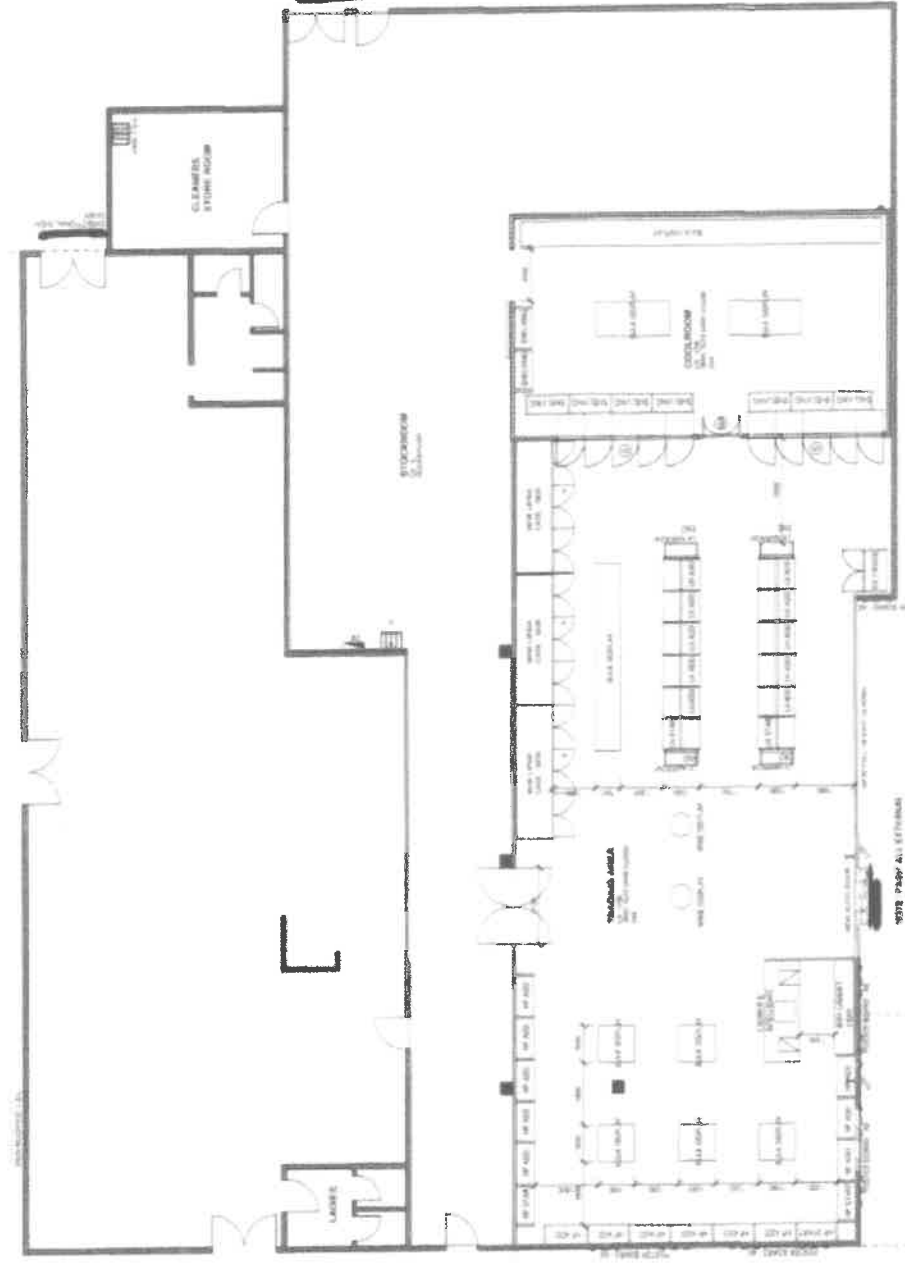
Expanded Bottle Shop – Floor Plan and Shop Layout.
